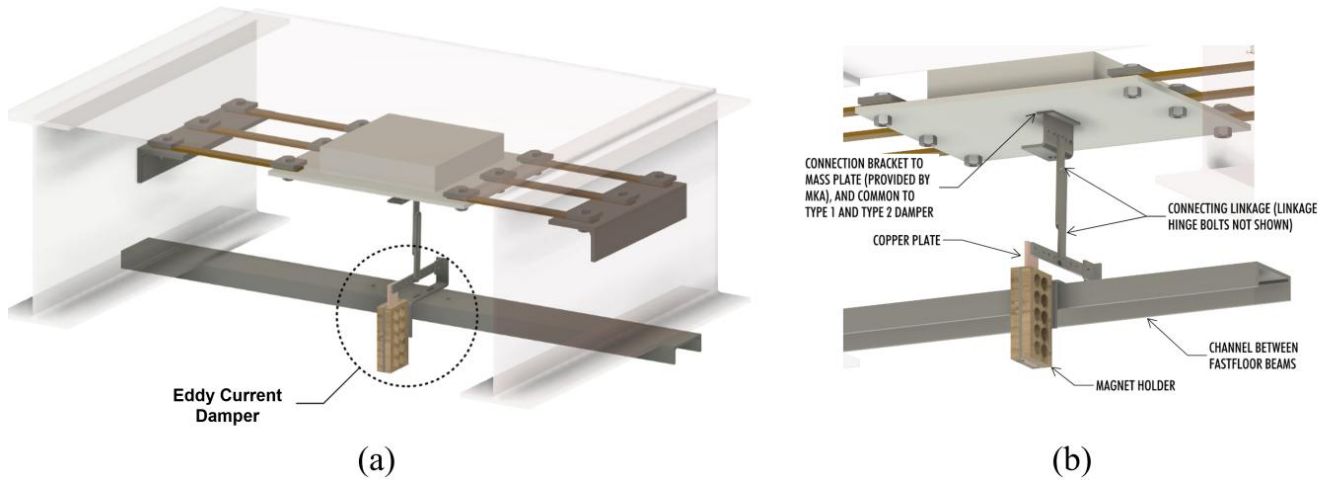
Schematic of the eddy current TMD design by MKA. (a) View of the TMD assembly. (b) A view of the eddy current damper element with part names
